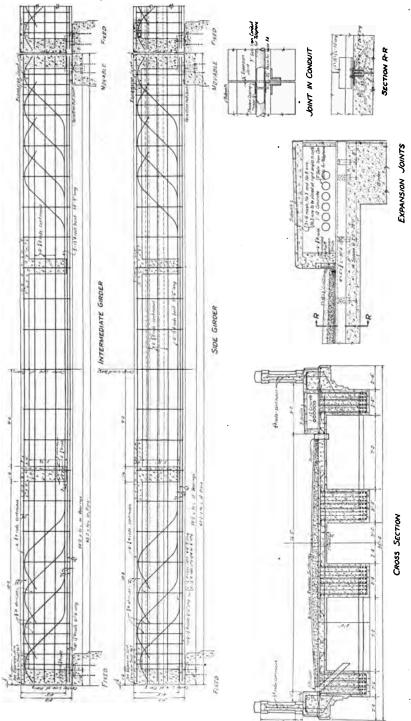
Cohasset Narrows Bridge — Superstructure Details,
